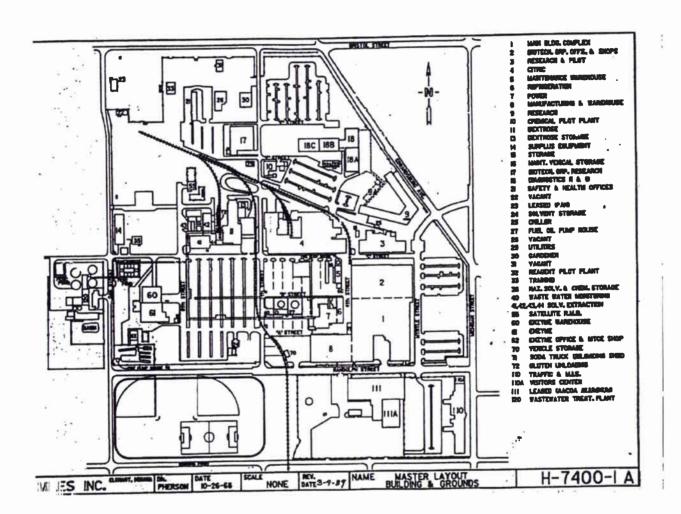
1 Master Layout 9f Buildings and Grounds
